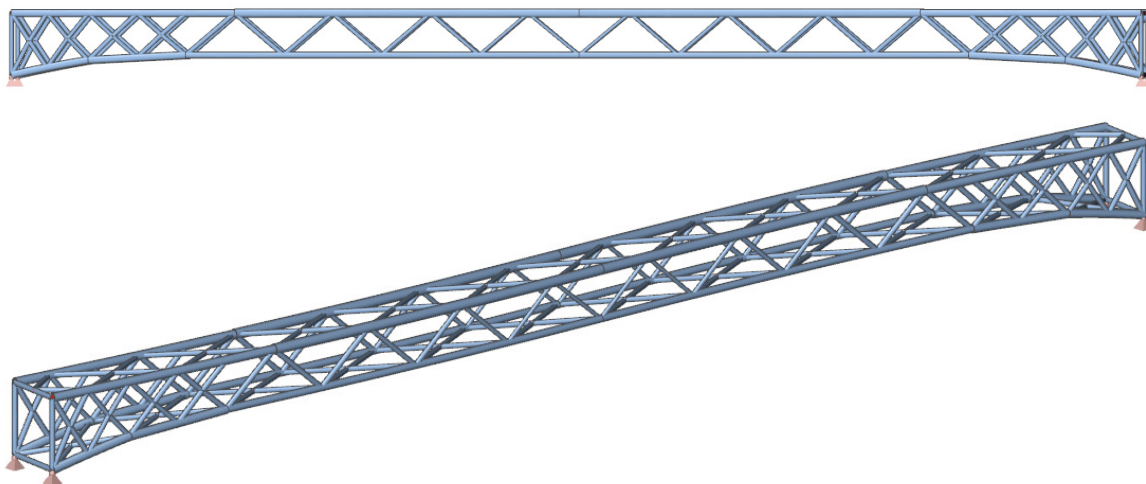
MAIN GIRDER LAYOUT (SIDE VIEW ON THE TOP, 3D VIEW ON THE BOTTOM)
